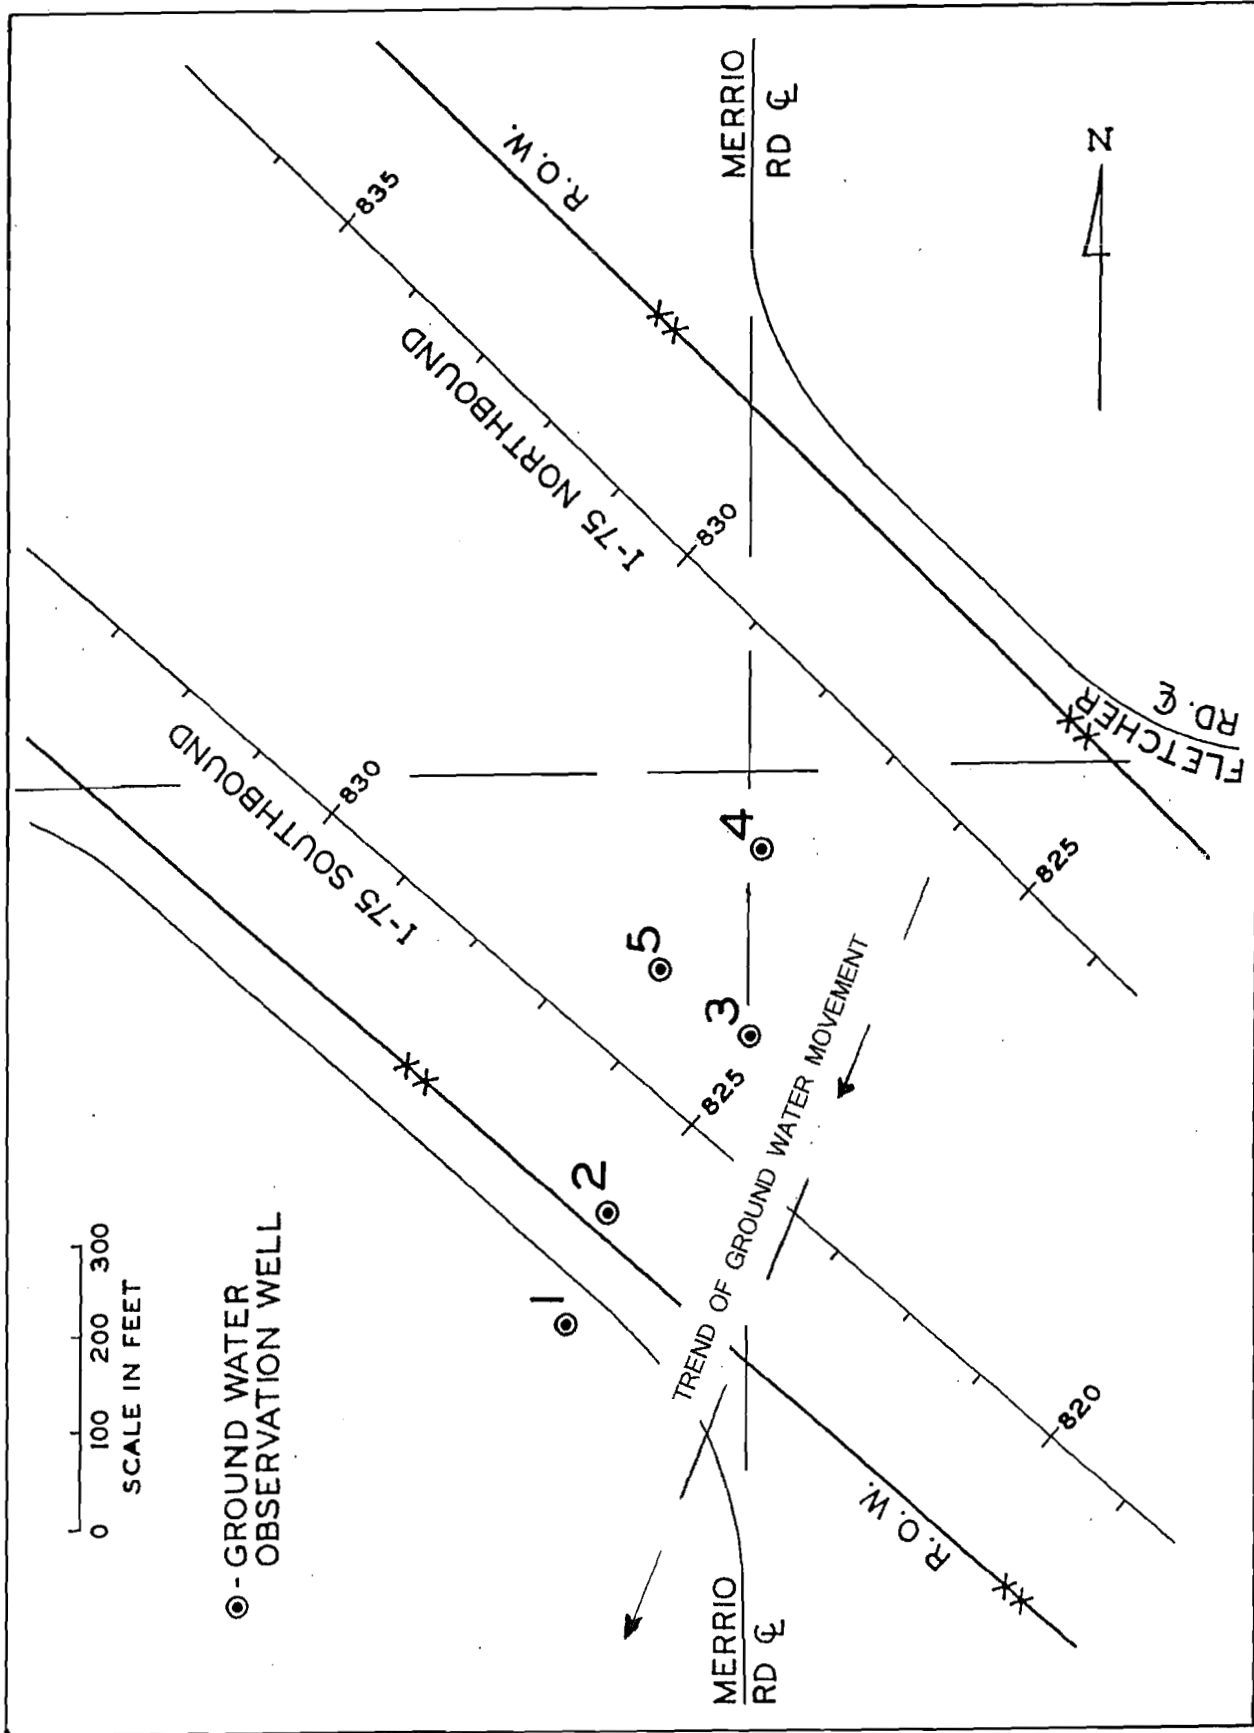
I 75 well locations, south of Grayling. Roadway opened to traffic in 1971.
